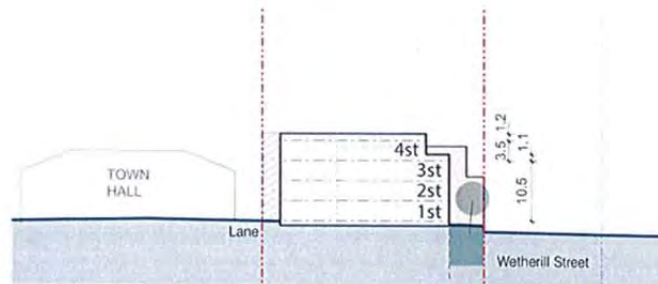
Wetherill Street _ Building envelope _ Commercial floor heights _ Section A-A
